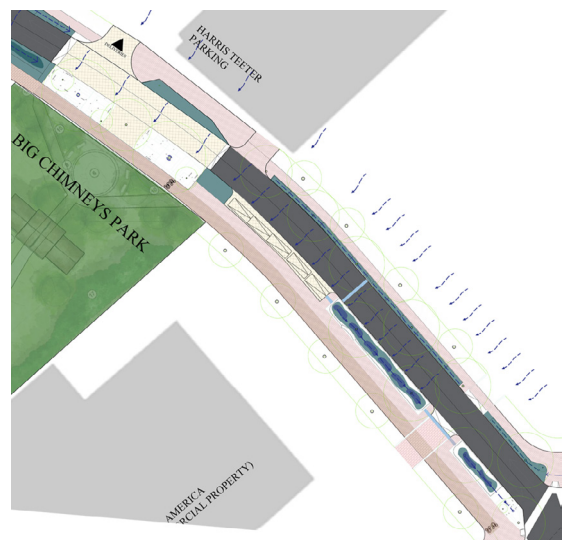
Proposed Plan for Road Segment A3. (Source: Author.)
